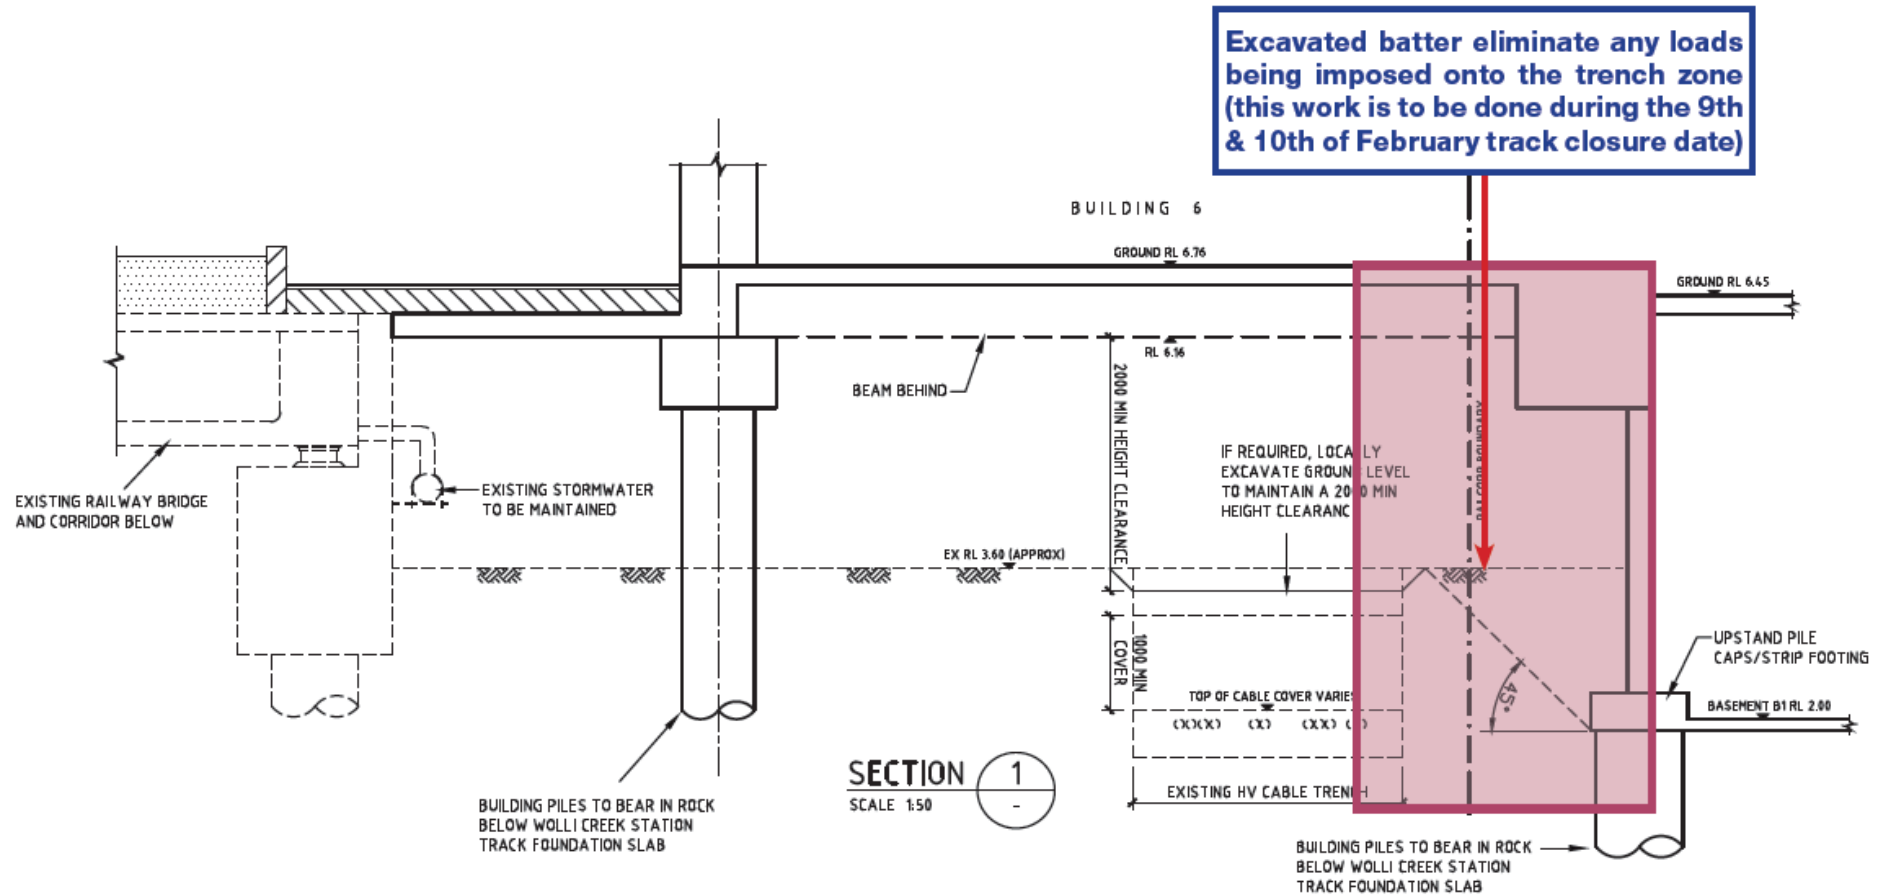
Section 2 Diagrammatic Explanation – Excavation Works (Detailed Section)
